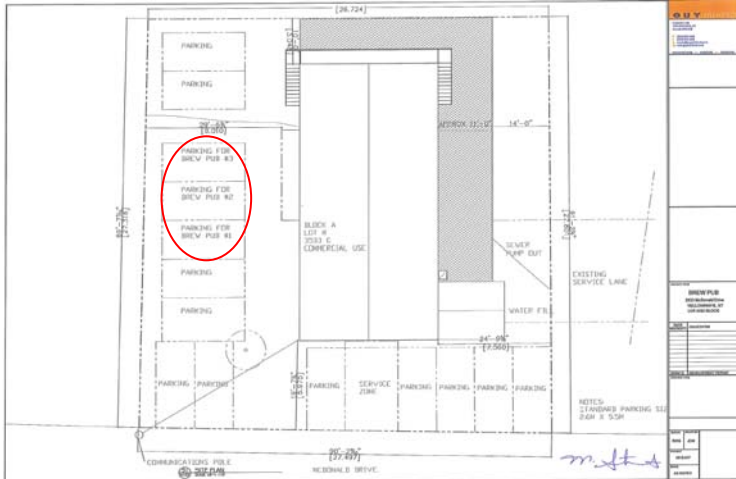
Site Plan of Proposed Conditionally Permitted Use
